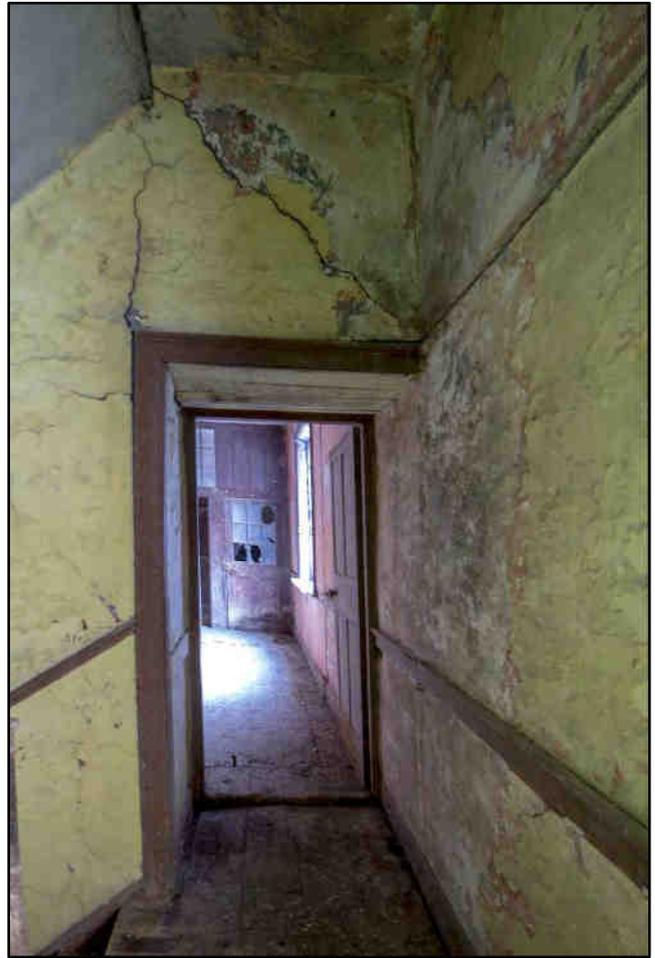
F1 looking towards F3 with cracking in brickwork above
